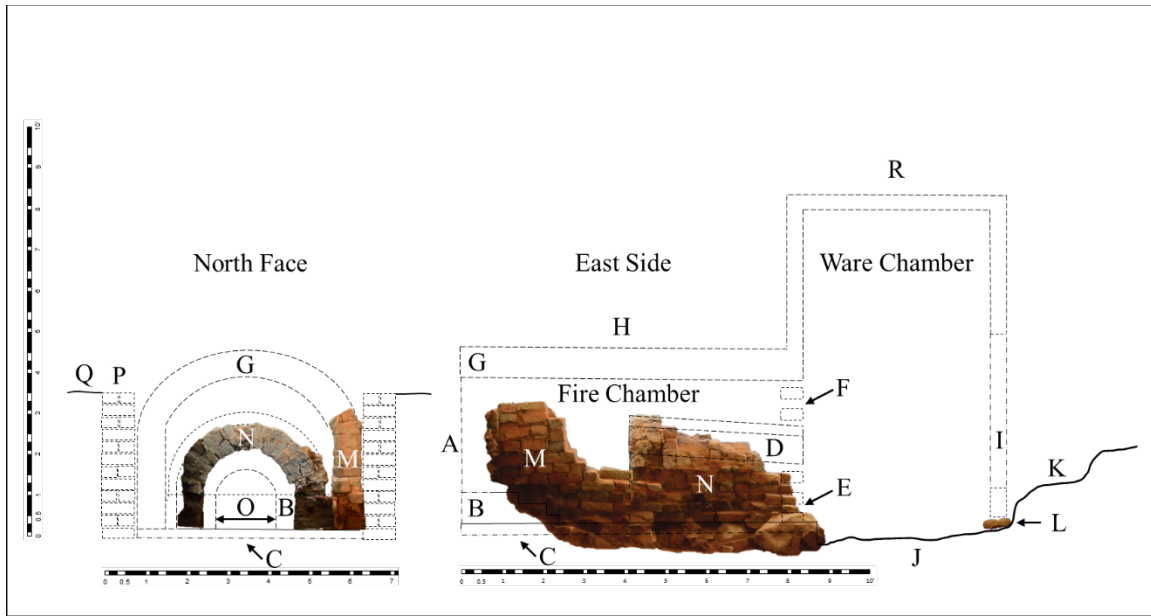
First hypothesized 1811 kiln design using 3D photogrammetry of existing ruin and conjecture. Showing: A) fire chamber opening; B) step down into fire chamber; C) brick floor; D) vault of interior tunnel; E) bag wall; F) additional support for roof of fire chamber (perhaps a continuation of the bag wall); G) vault of exterior tunnel; H) roof of fire chamber; I) temporary entrance for ware chamber; J) floor of ware chamber; K) step cut into subsoil; L) builders' trench foundation stones in situ; M) intact portion of outer fire chamber tunnel; N) intact portion of interior fire chamber tunnel; O) rear opening of interior fire chamber tunnel; P) conjectural brick support walls between fire chamber and subsoil; Q) original ground surface; R) roof of ware chamber with one or more vent holes or small chimney.
